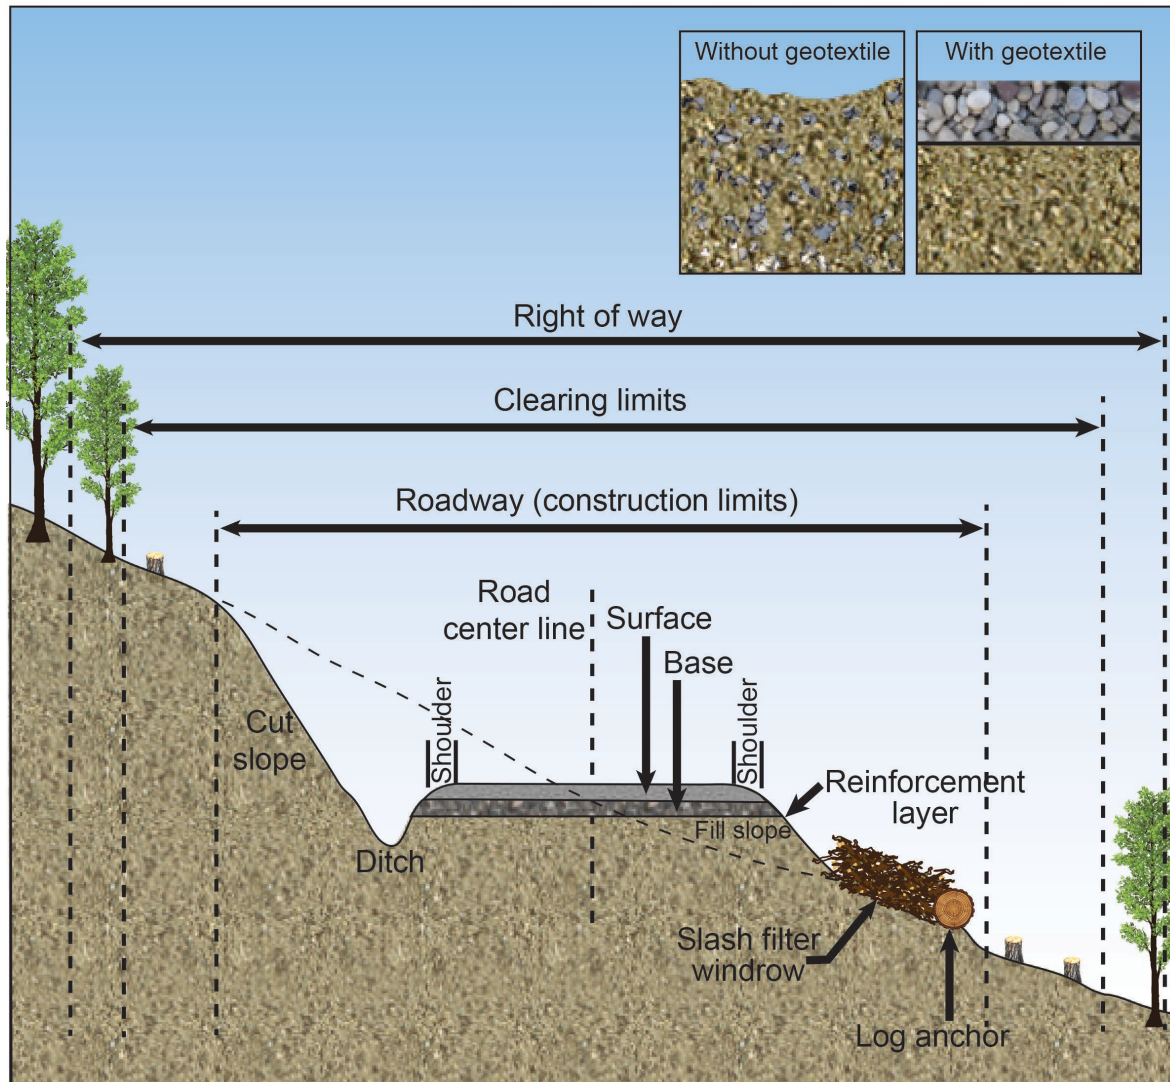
Typical cross section for new road construction (University of Idaho 2015).
